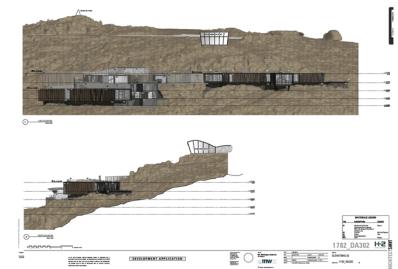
Extract: 1782_DA302 ELEVATIONS 02
